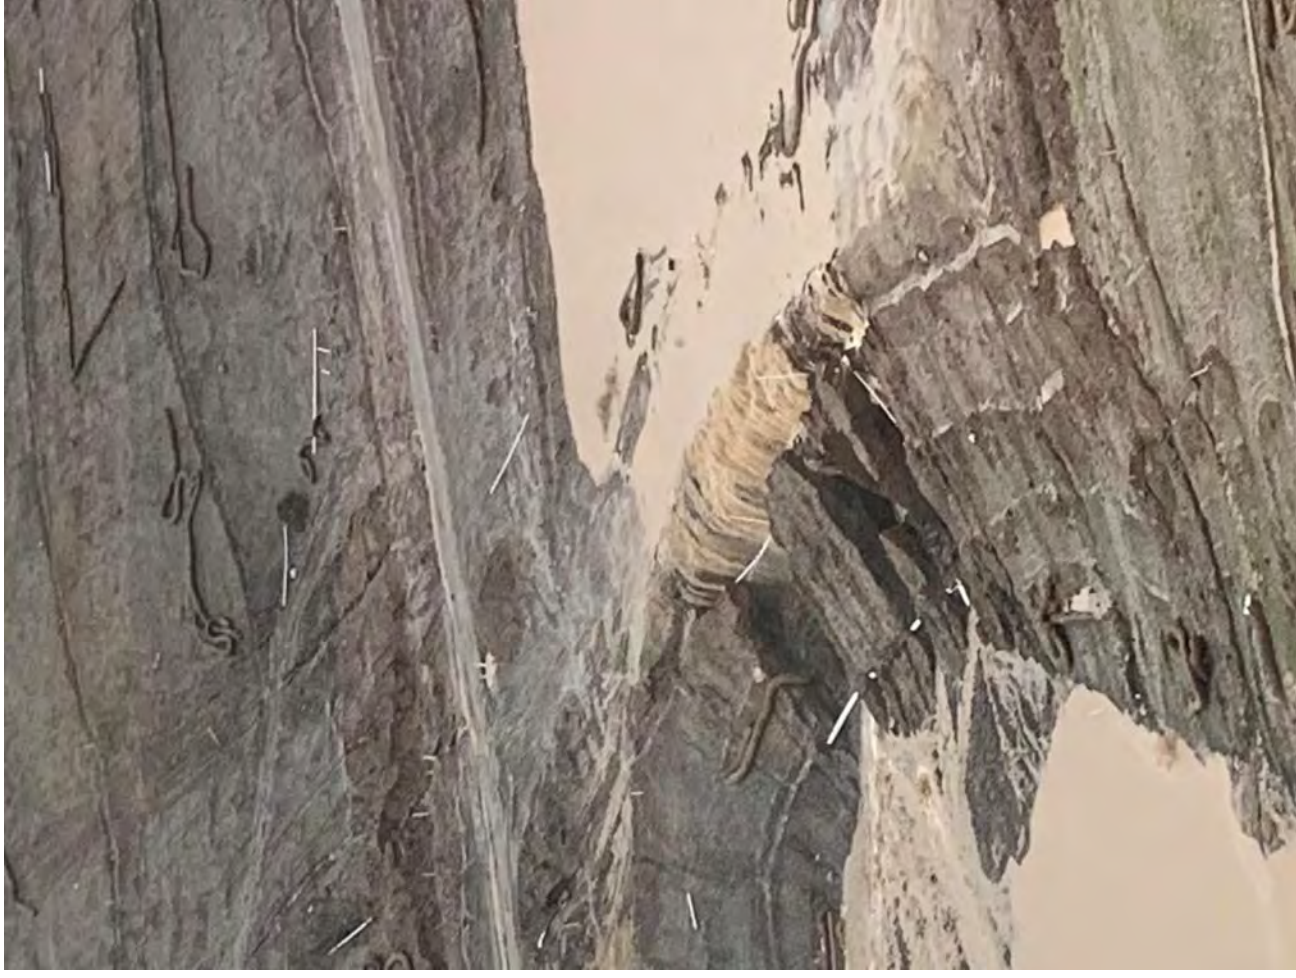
Looking west at the berm between Basin 8 and Basin 9, taken during the December storms. A period of intense rainfall resulted in a washout on the slope of the berm.
